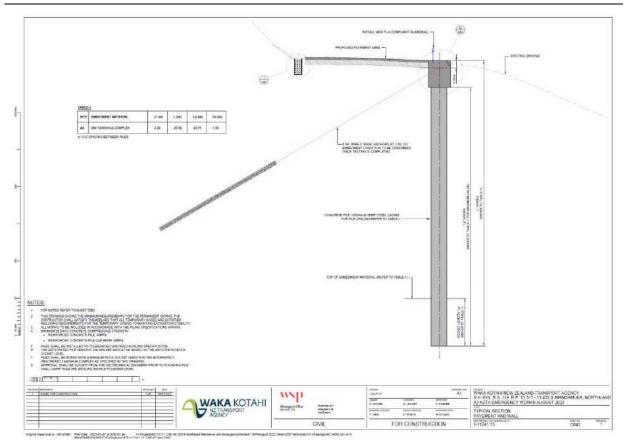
Typical cross section, concrete cap and pile retaining, channelling and pavement.
